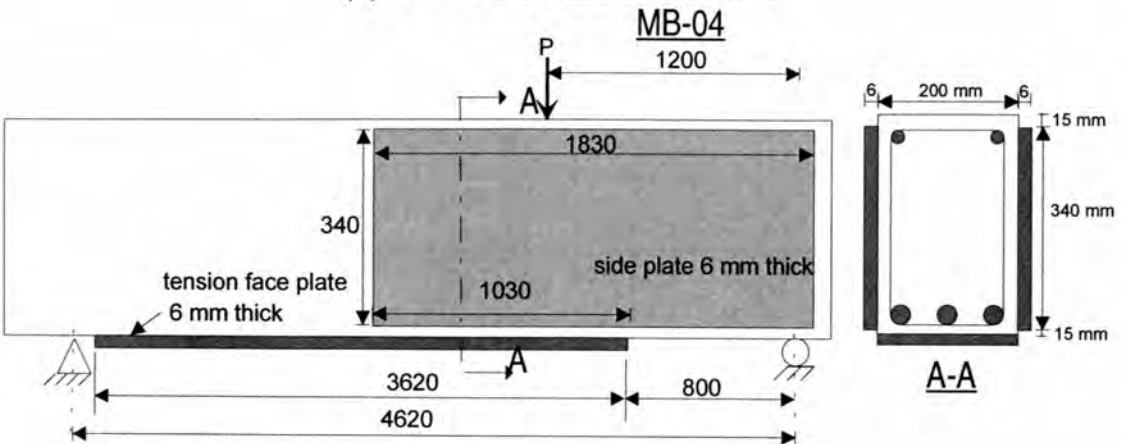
Reinforcement details of basic reinforced concrete beam
